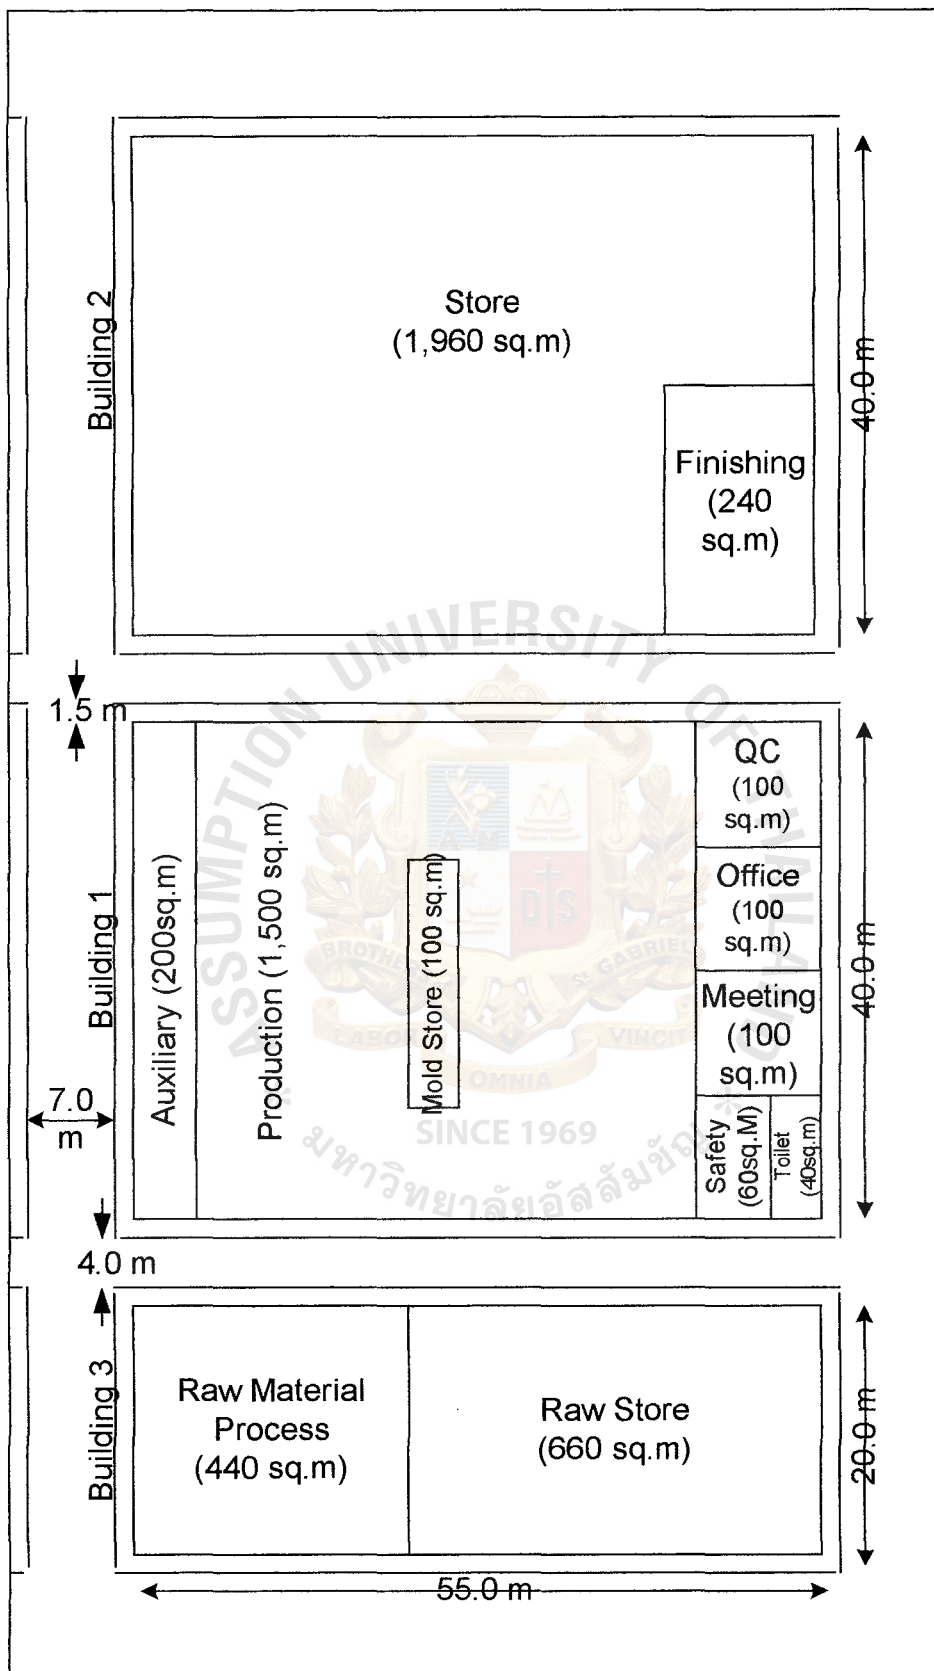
Adjusted Overall Layout-Ground Floor.
